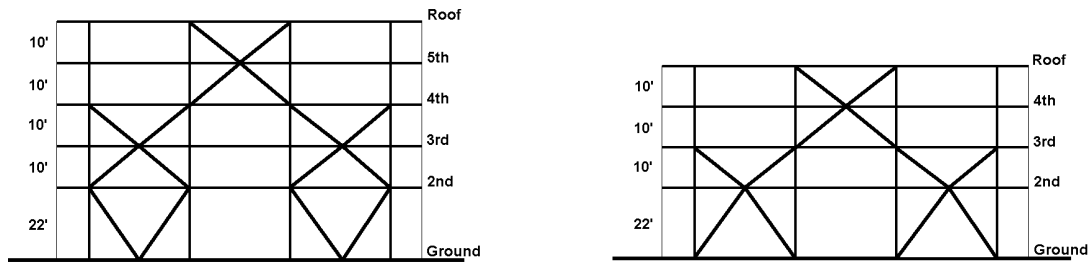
Elevations of two steel braced frame structures that are square in plan. According to the 1997 UBC, the taller structure on the left is redundant and reliable and the shorter structure on the right is so nonredundant and unreliable that it is penalized with a 37% increase in its design base shear coefficient. According to the 2000 IBC, both structures are nonredundant and unreliable. As for ASCE 7-05, the structures would have to be structurally analyzed to determine whether or not removal of any single brace would reduce any story strength by more than 33% or result in an extreme torsional irregularity.
